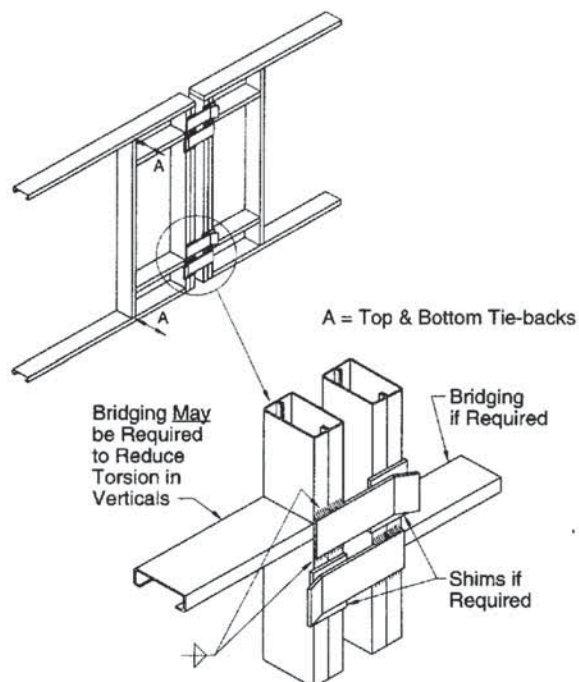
Alignment connections. (Taken from Glass Fiber Reinforced Concrete Panels, Fourth Edition, PCI. Used with permission, Precast/Prestressed Concrete Institute.)
